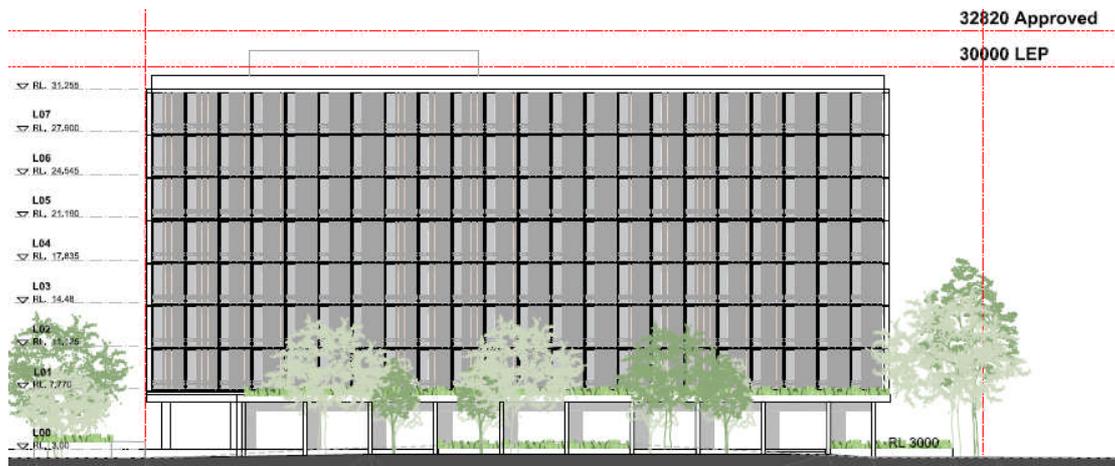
The western elevation of the hotel building adjacent to Cottage Creek. (Bates Smart)
